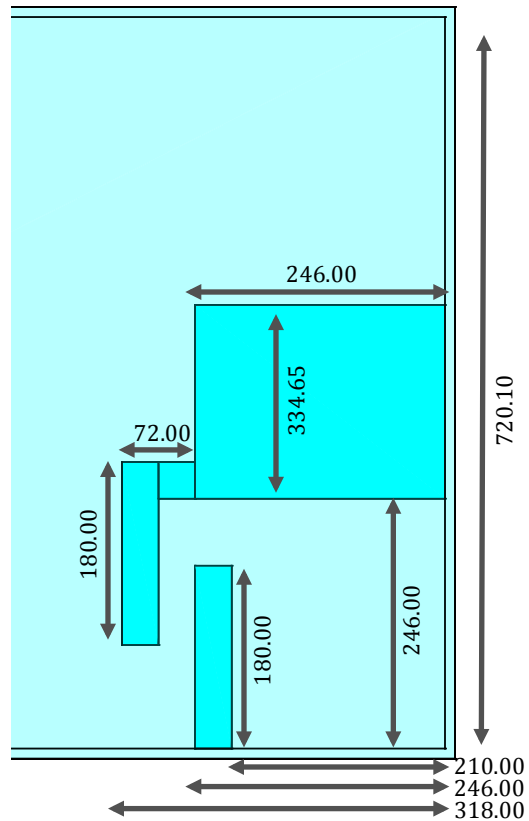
Positions and dimensions of the shielding blocks. Building walls are 10 inches thick. Dimensions are depicted in inches.
